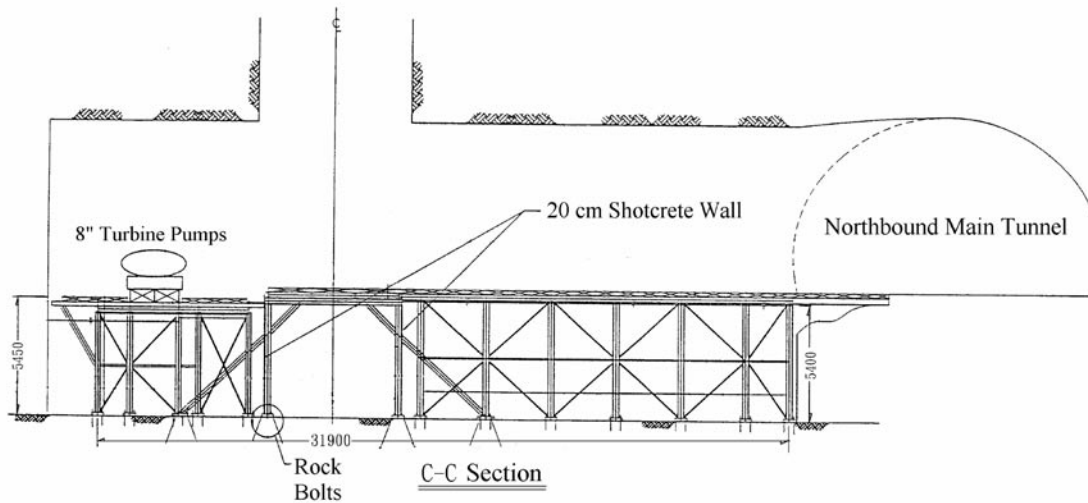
The Longitudinal Section of Deck Platform in the Exhaust Air Ventilation Cavern
